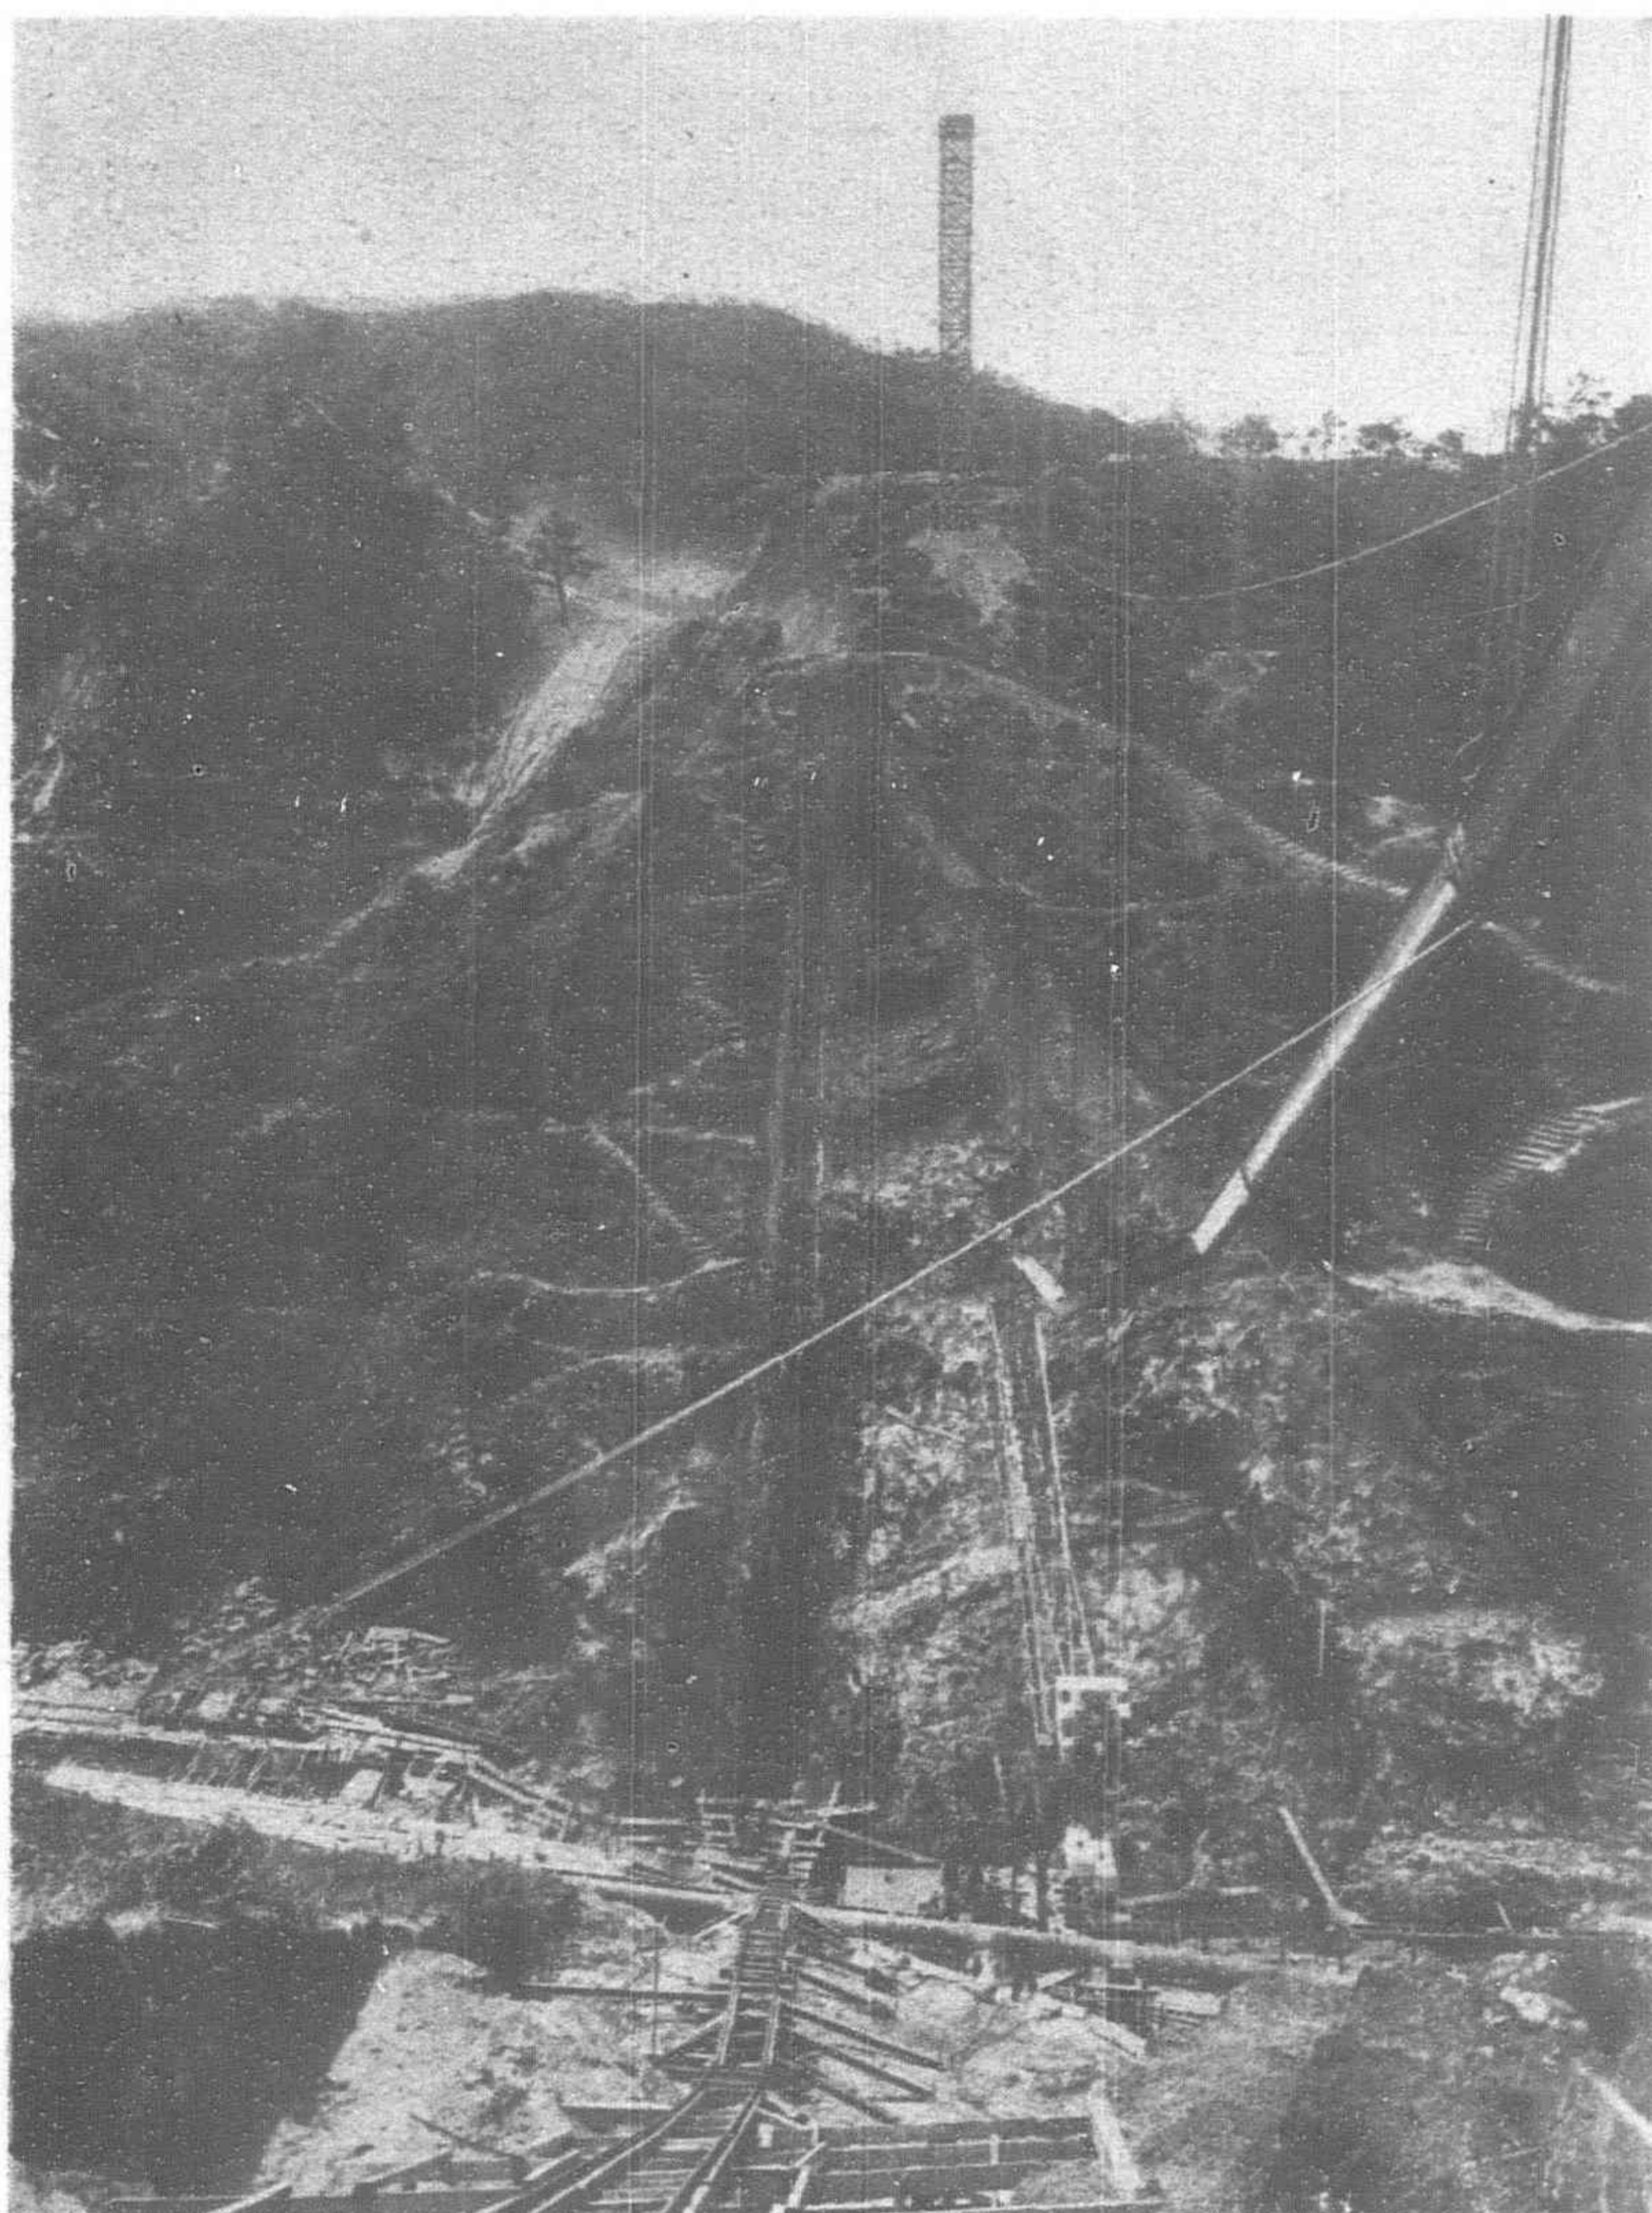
Transporters and Cranes used in construction of the Kowloon Byewash Dam
